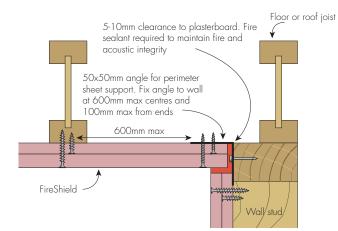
Fire Rated Ceiling to Wall Direct fixed to joist
